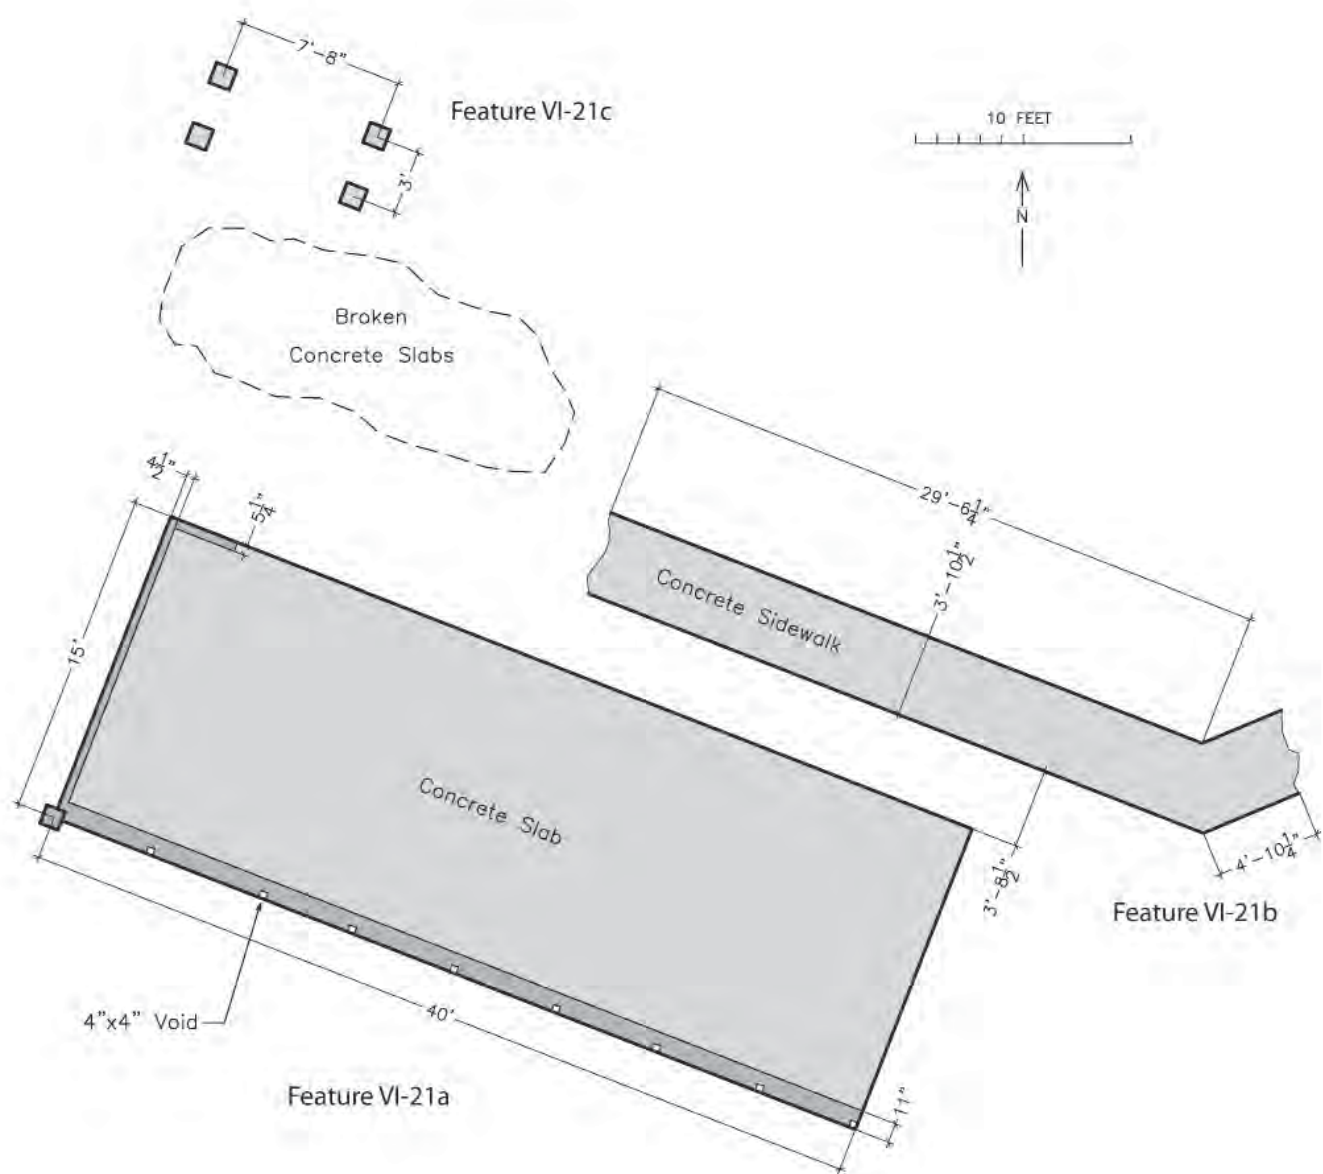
Feature VI-21, concrete foundation, sidewalk, and footers.
